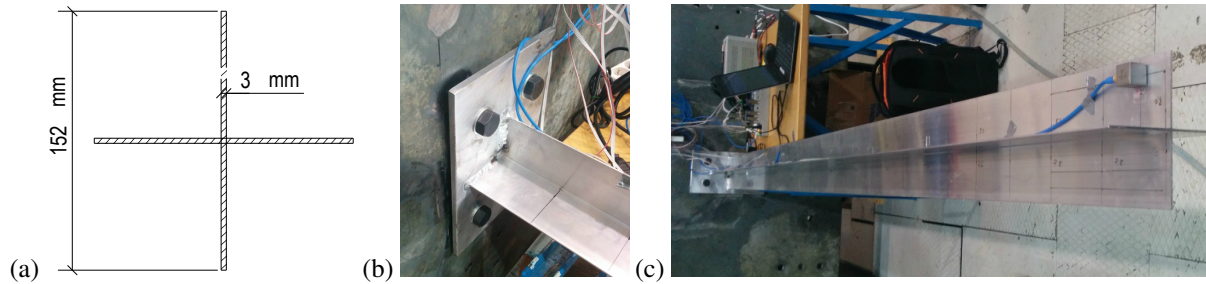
Left: cross section geometry; middle: bolted support and end plate-beam connection; right: beam mounted to wall (rotated).
